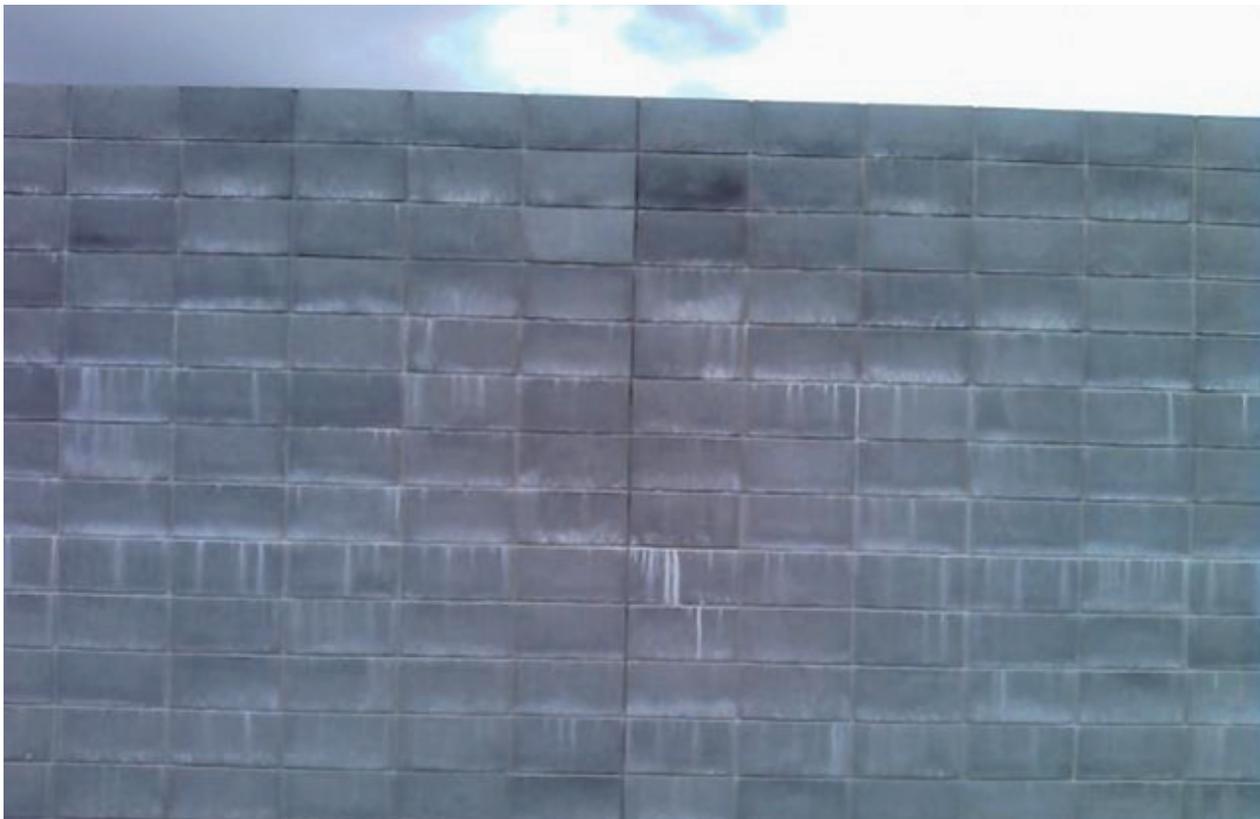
Typical efflorescence pattern on exterior concrete wall.
